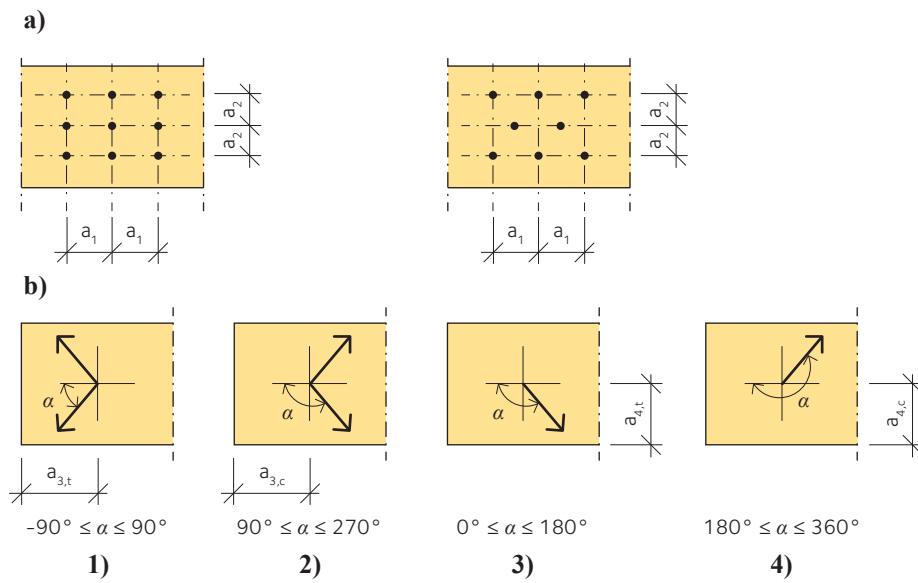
Definition of edge and end distances and spacings between fasteners.
